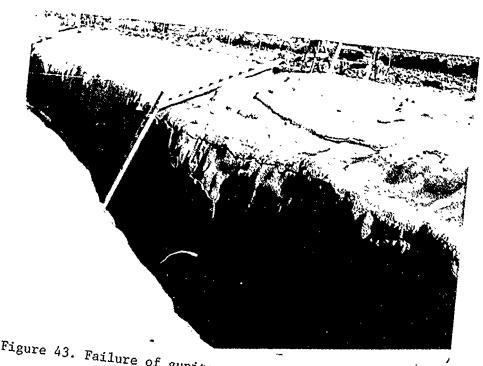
Failure of gunite on hydropower conduit excavation.
